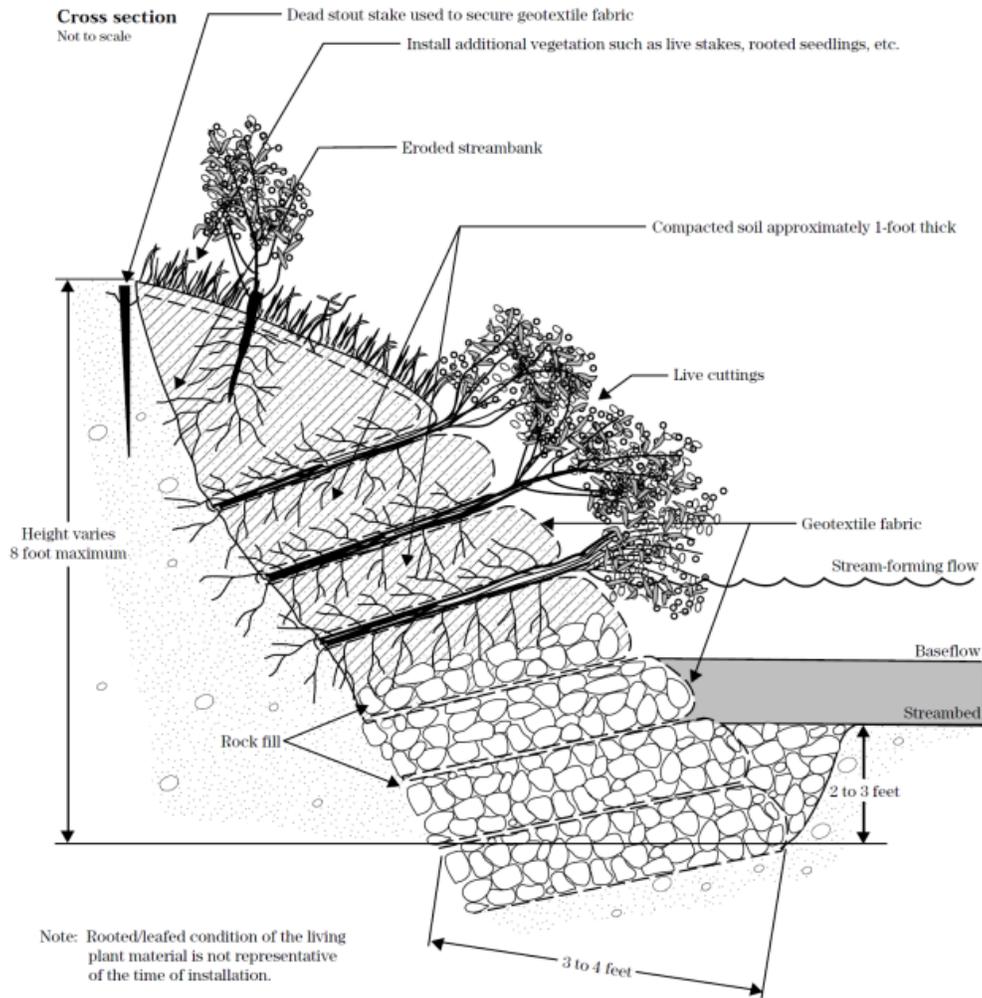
D: Design details of mechanically stabilized earth walls. Source: NRCS (1996).
